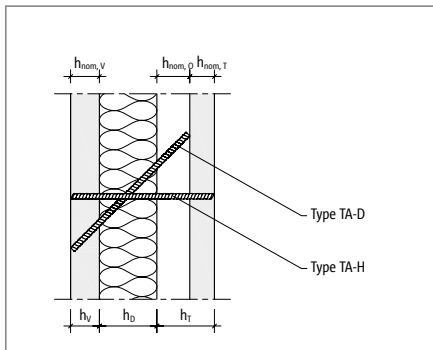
Schöck Isolink® type TA-H, TA-D: Cross-section details for the element wall  $h_{nom,V} = h_V$
